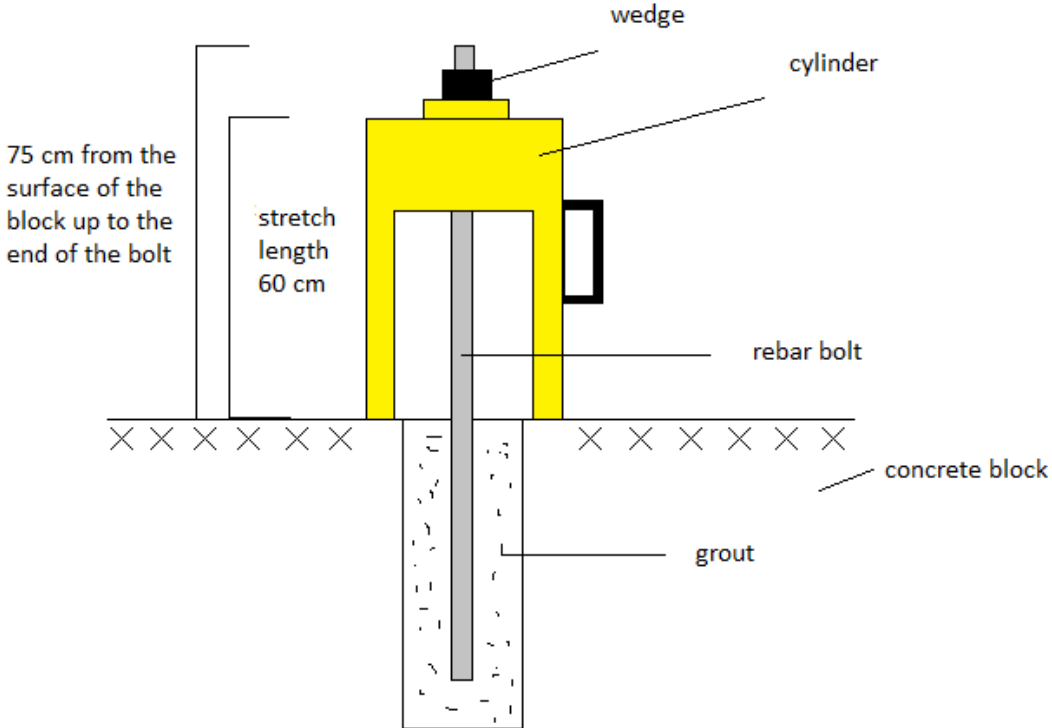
The pull-out test setup. Rebar bolt grouted in concrete block and hydraulic jack used to pull out the bolt. The tested stretch length is 60 cm.
